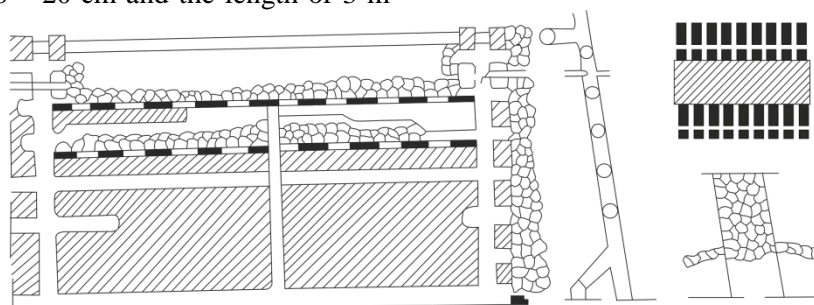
System of sub-level caving of ores and rocks with cable-stayed canopy
